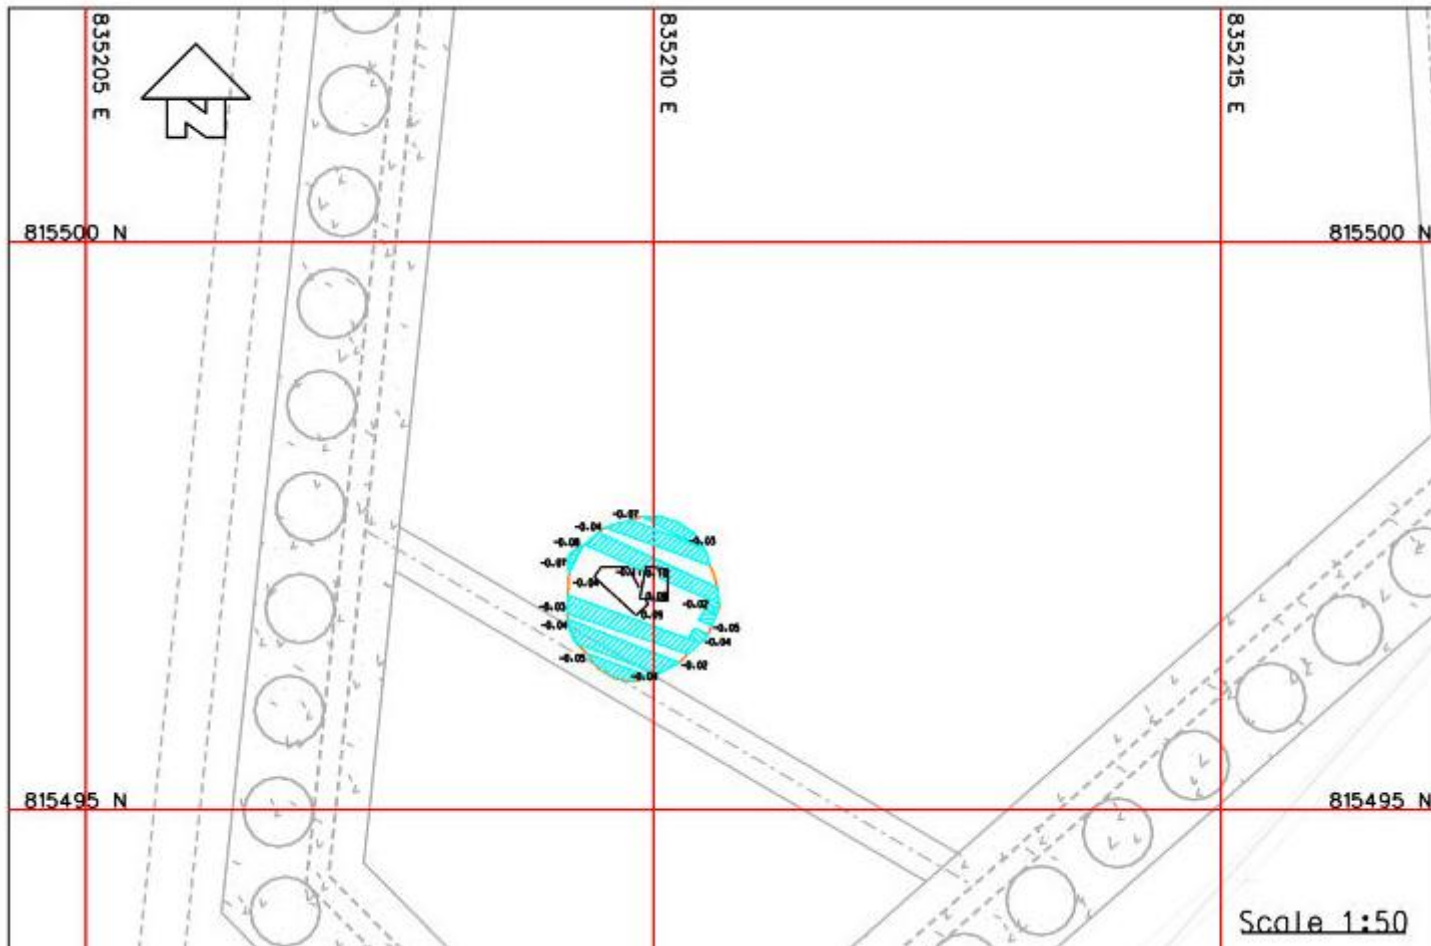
Drawing of bottom of well (901-RISC-SUR-000723A) (drawing at 75%)
